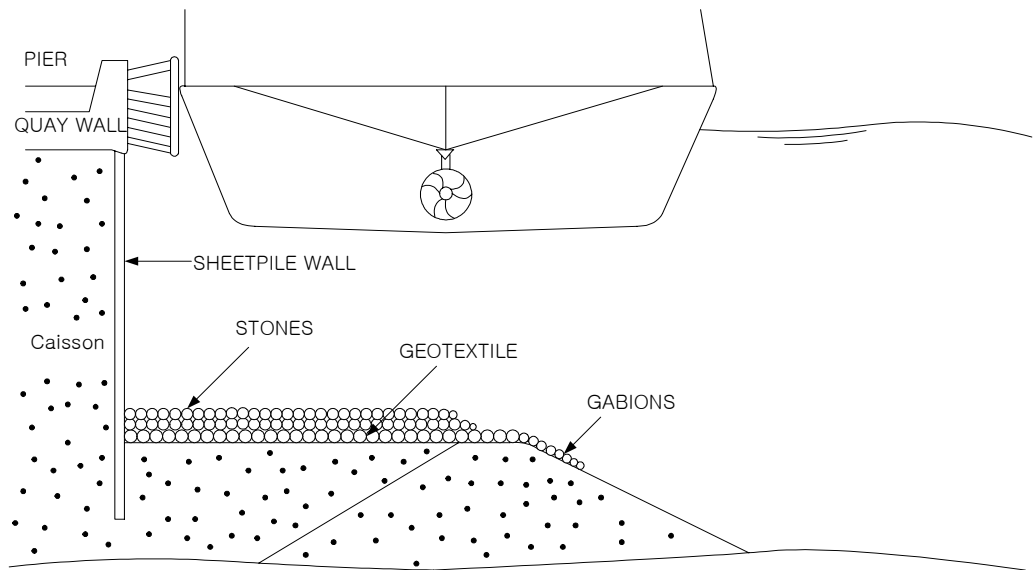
A Mooring vessel and detailed bottom sketch
